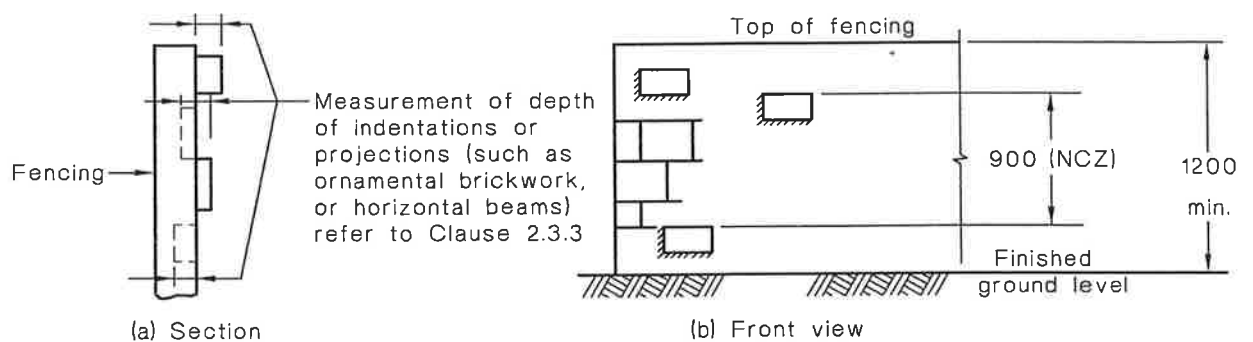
(in part) PERPENDICULAR FENCING DIMENSIONS
